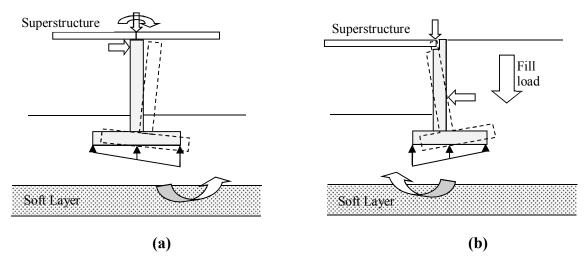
Schematic. Horizontal deformations at the superstructure level due to settlement and rotation of spread footings for the case of soft layers within DOSI. (a) at piers, (b) at abutments.
